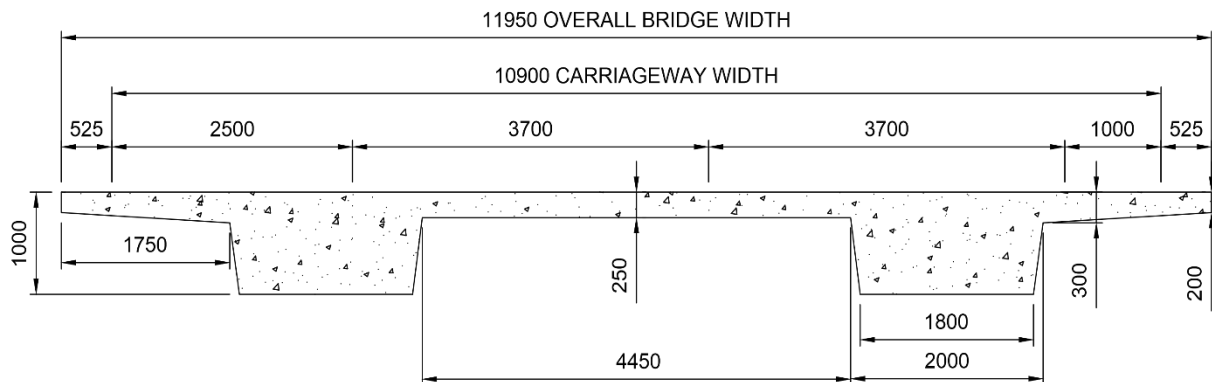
Cross-section of bridge deck with the lane arrangement (units in mm).
